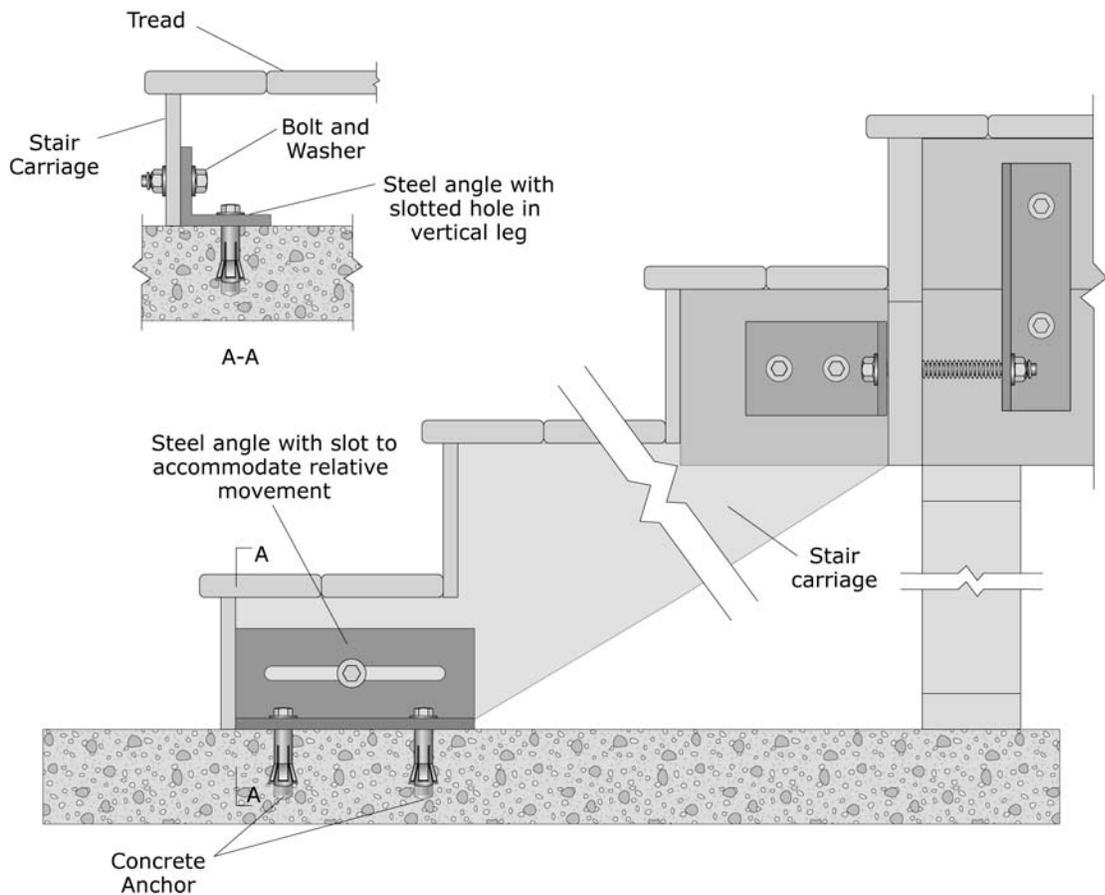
Stairway with landing with single run between floors (ER).
